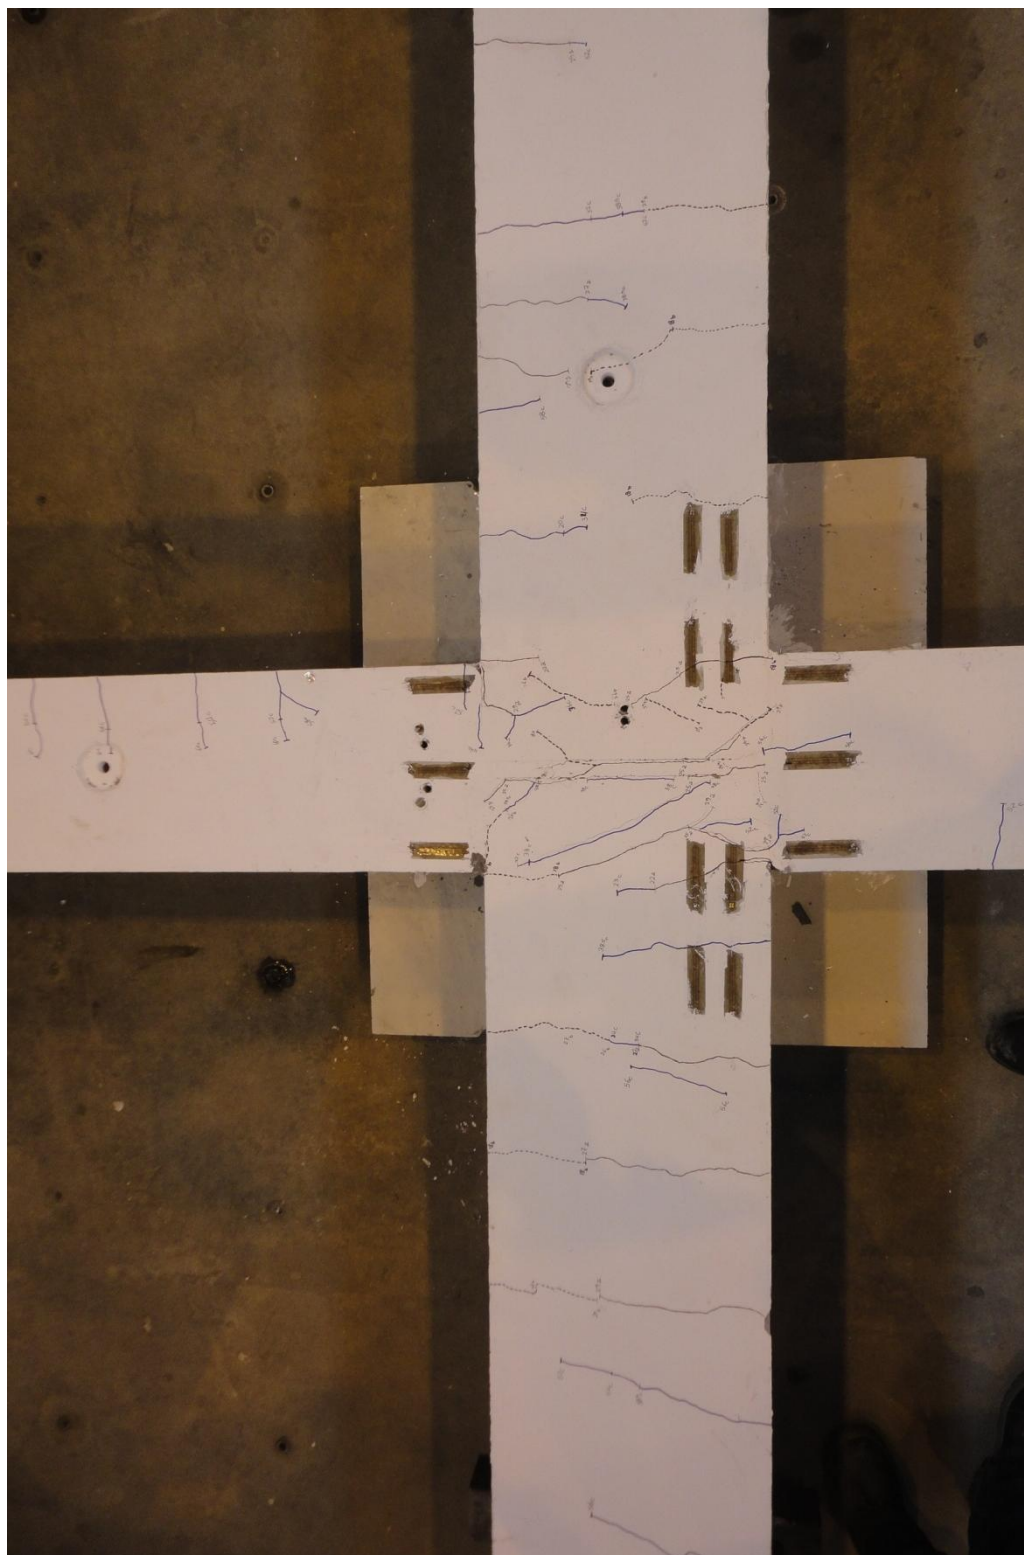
might give misleading information about the location of failure; however, by cutting the connection at location A-A (see Figure 6.11a and Figure 6.11e), it is obvious that the failure was due to yielding of the column bars, where the cracks turned around the dowel bars.
